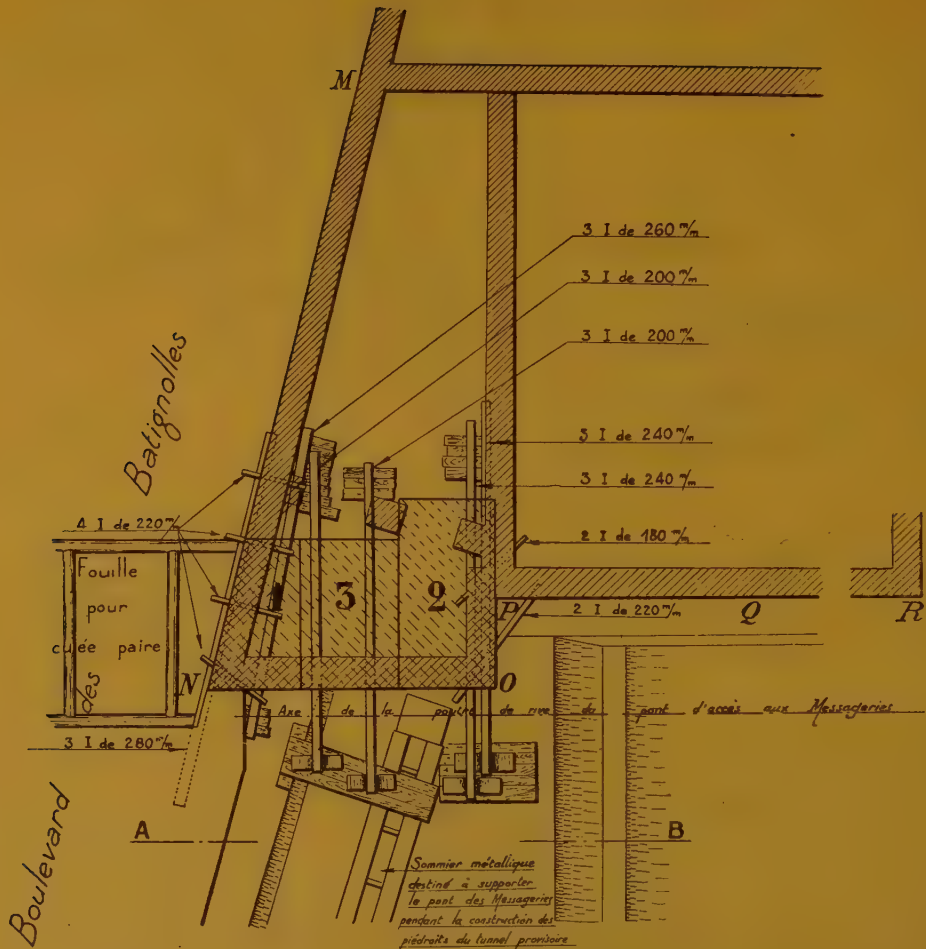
Supporting No. 43, Boulevard des Batignolles, by means of girders.
